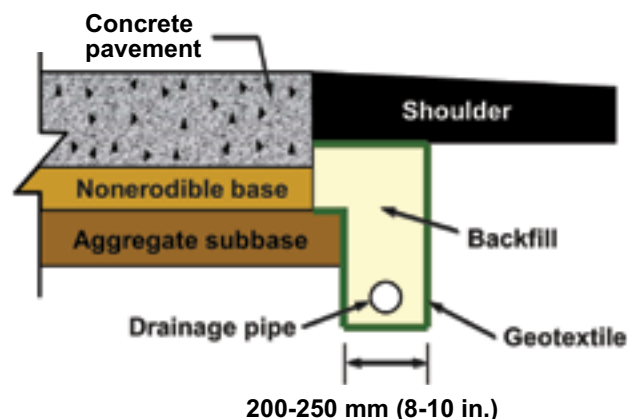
Recommended design for retrofitted pipe edgedrains (NHI 1999)
